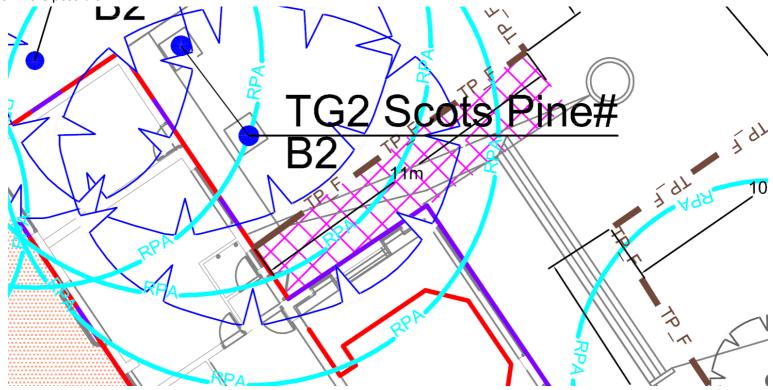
The soakaway chamber is located completely outside the RPA of TG2. Efforts at installation will be made to move the pipework further from the trees but any excavation to install will be undertaken by hand. The open excavation will be photographed. (Note: client to make contractor aware)
